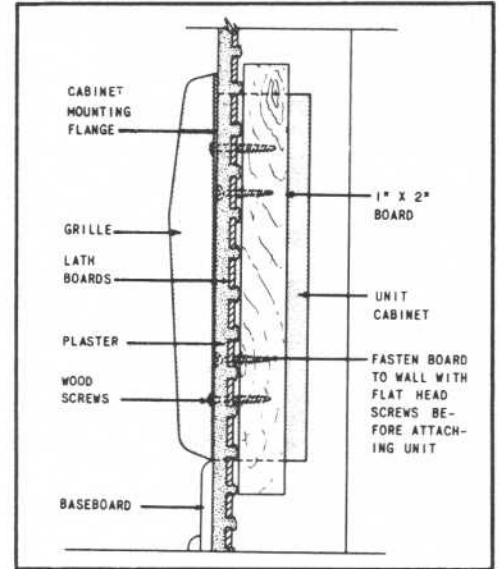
Method of Attaching Unit to Wood Lath and Plaster-Type Walls
